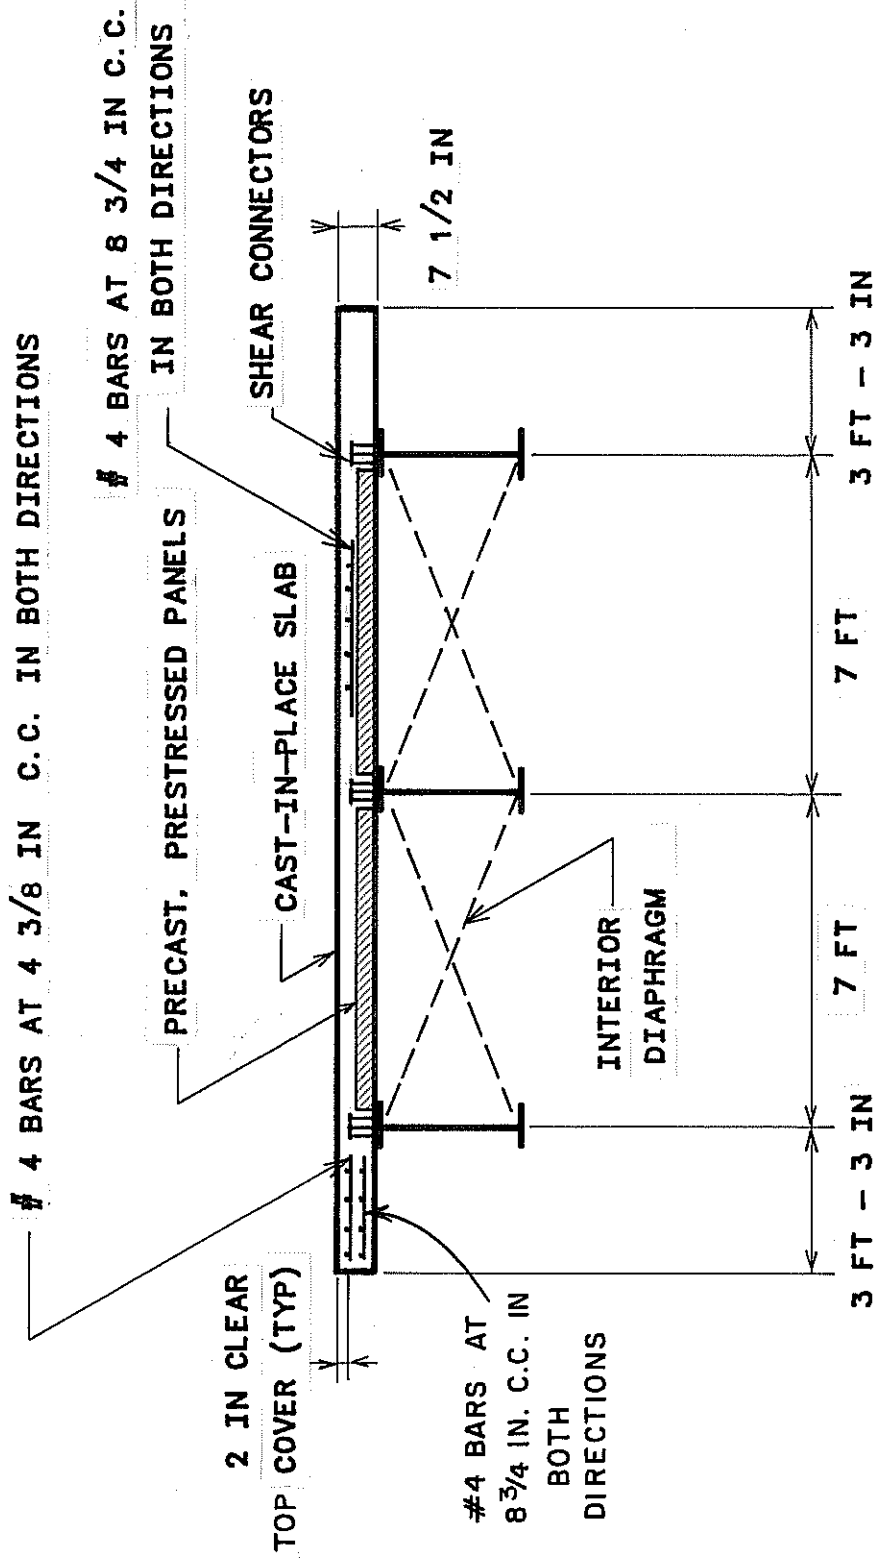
Cross section of laboratory specimen showing precast, prestressed panels
